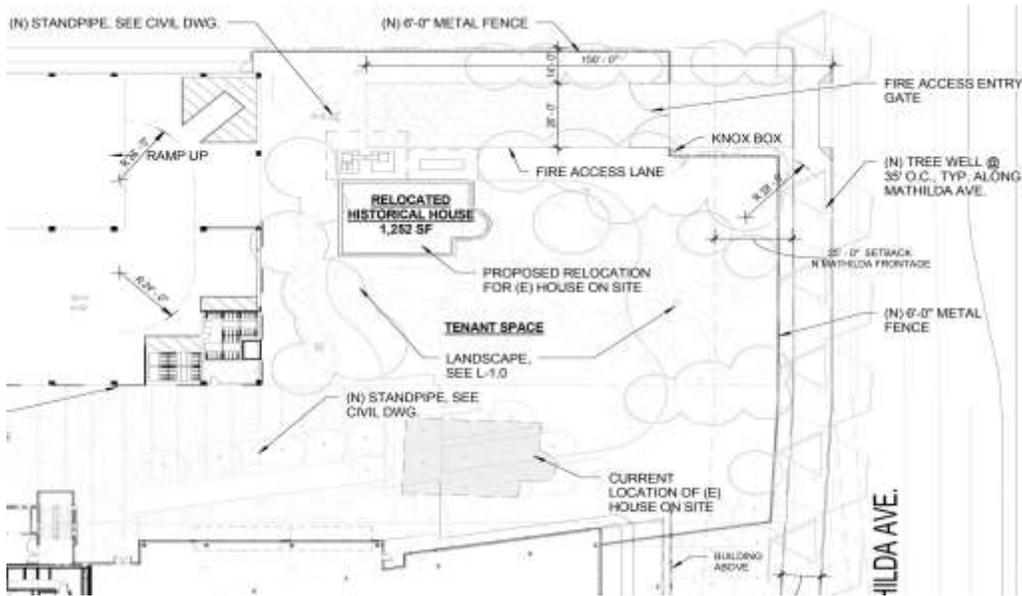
Site Plan detail showing the existing and proposed historic house locations
